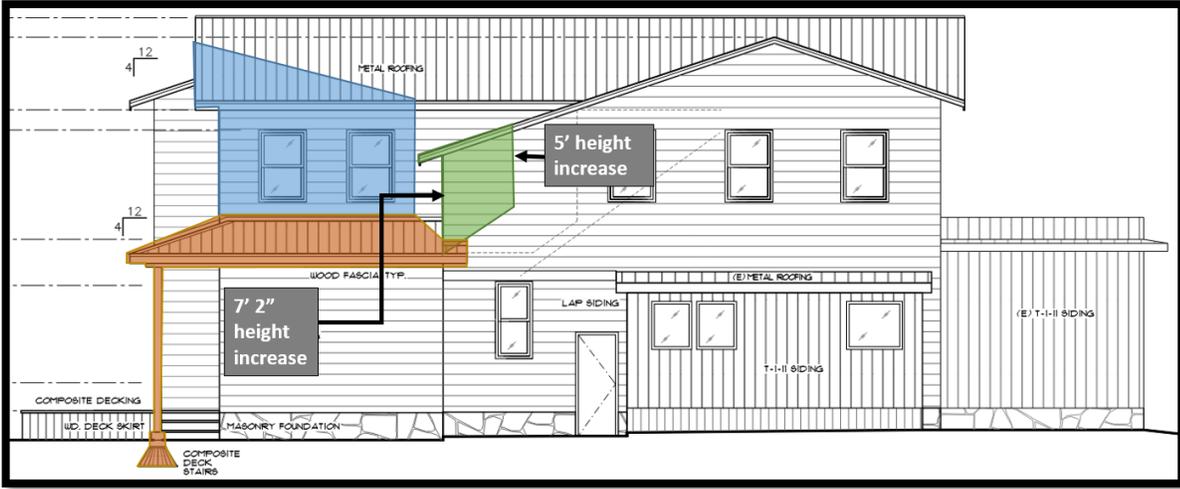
Figure A - View of Rear Elevation from Alley – Proposed Encroachments
